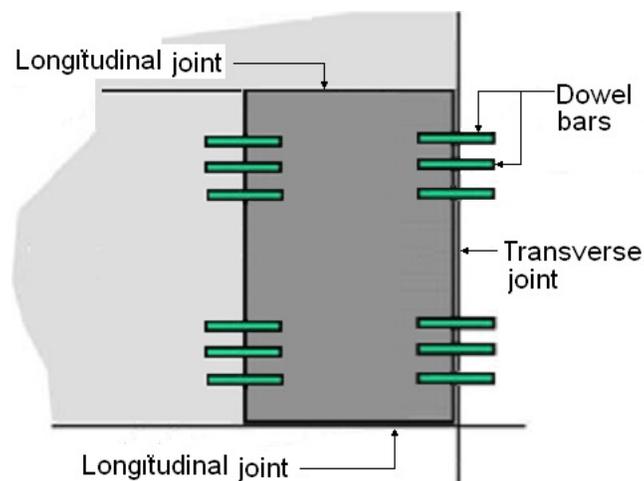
Dowel Bars Tied to Existing Concrete Slab
